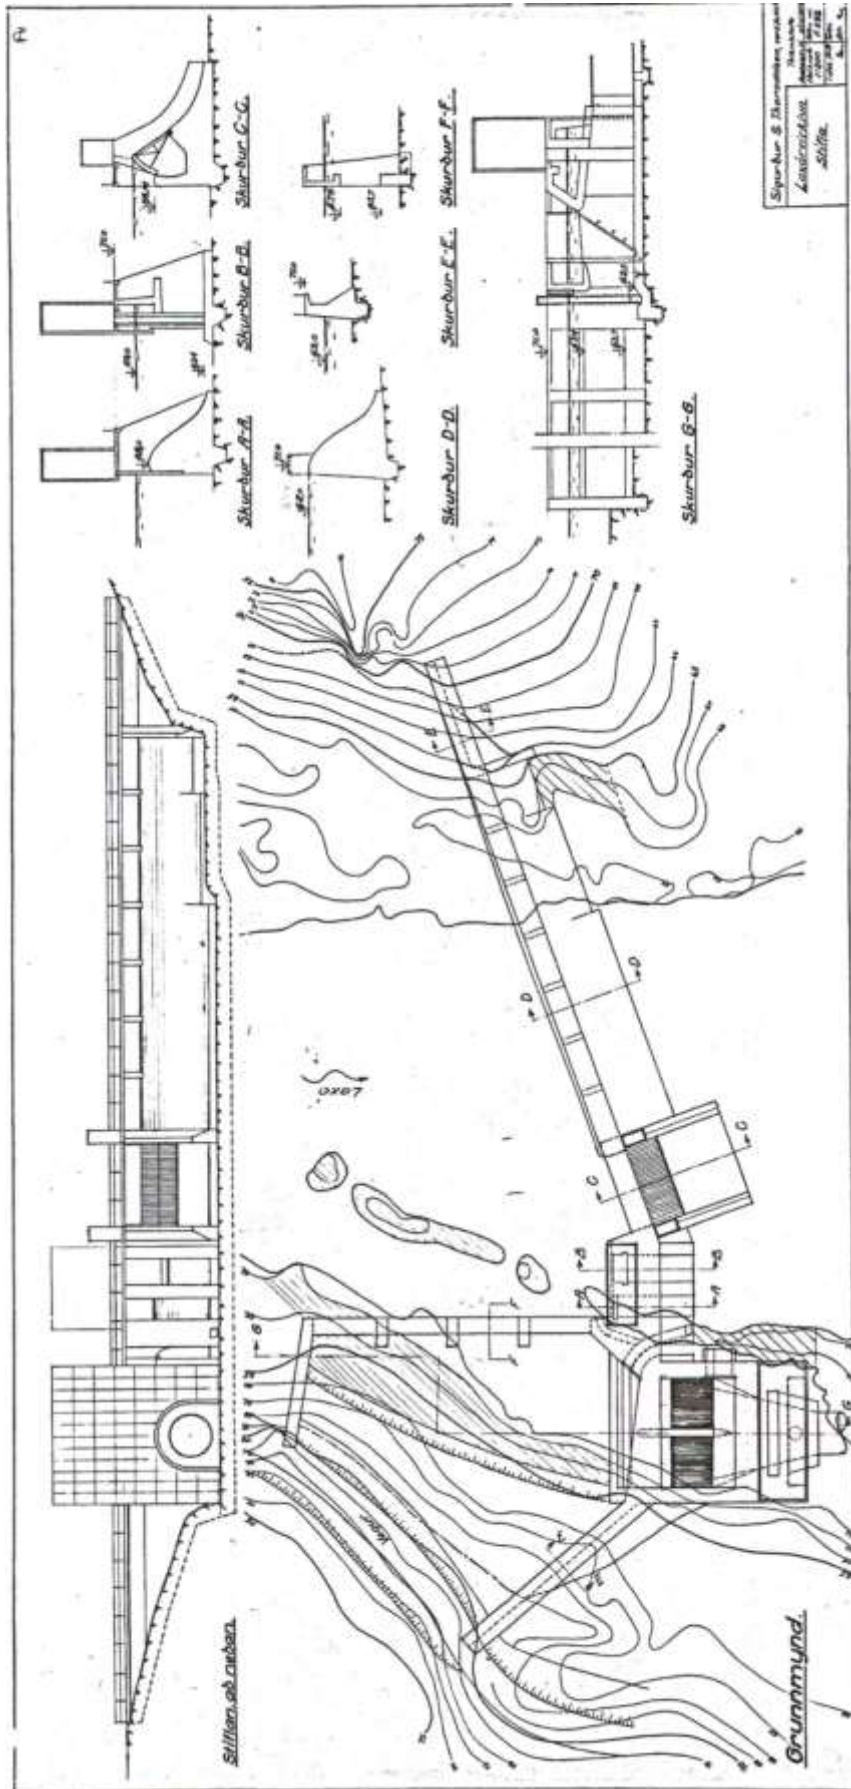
Layout and Sections of Laxá II Dam (Ref. 3)
